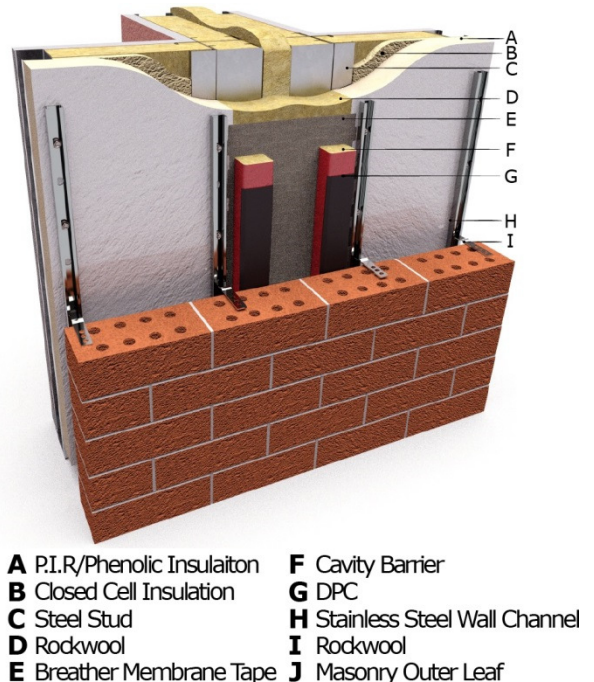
Party wall detail (Option 1) at junction with external masonry wall
